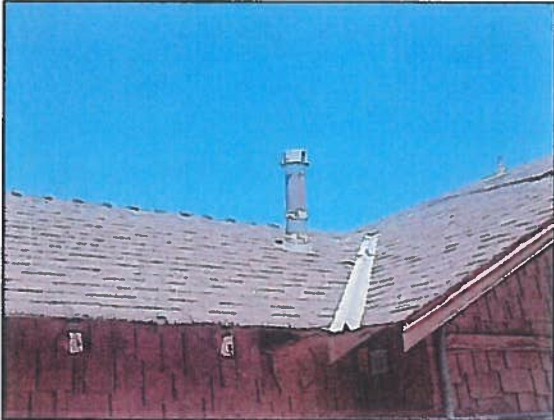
Roy Noon Meeting Hall – Worn asphalt shingle roofing
